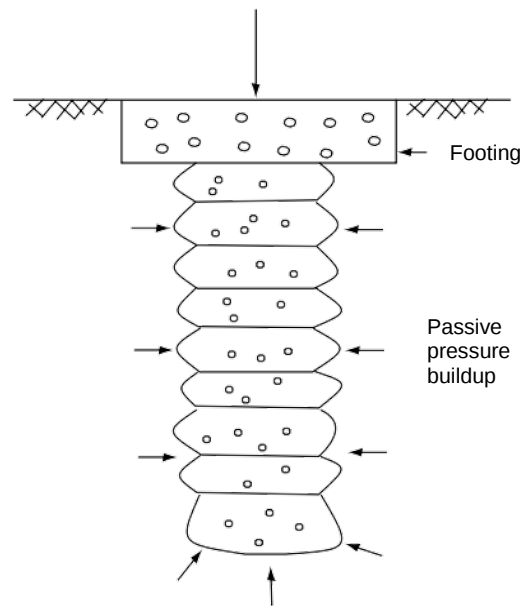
Schematic diagram of a rammed aggregate pier (The Foundation Engineering Handbook).
